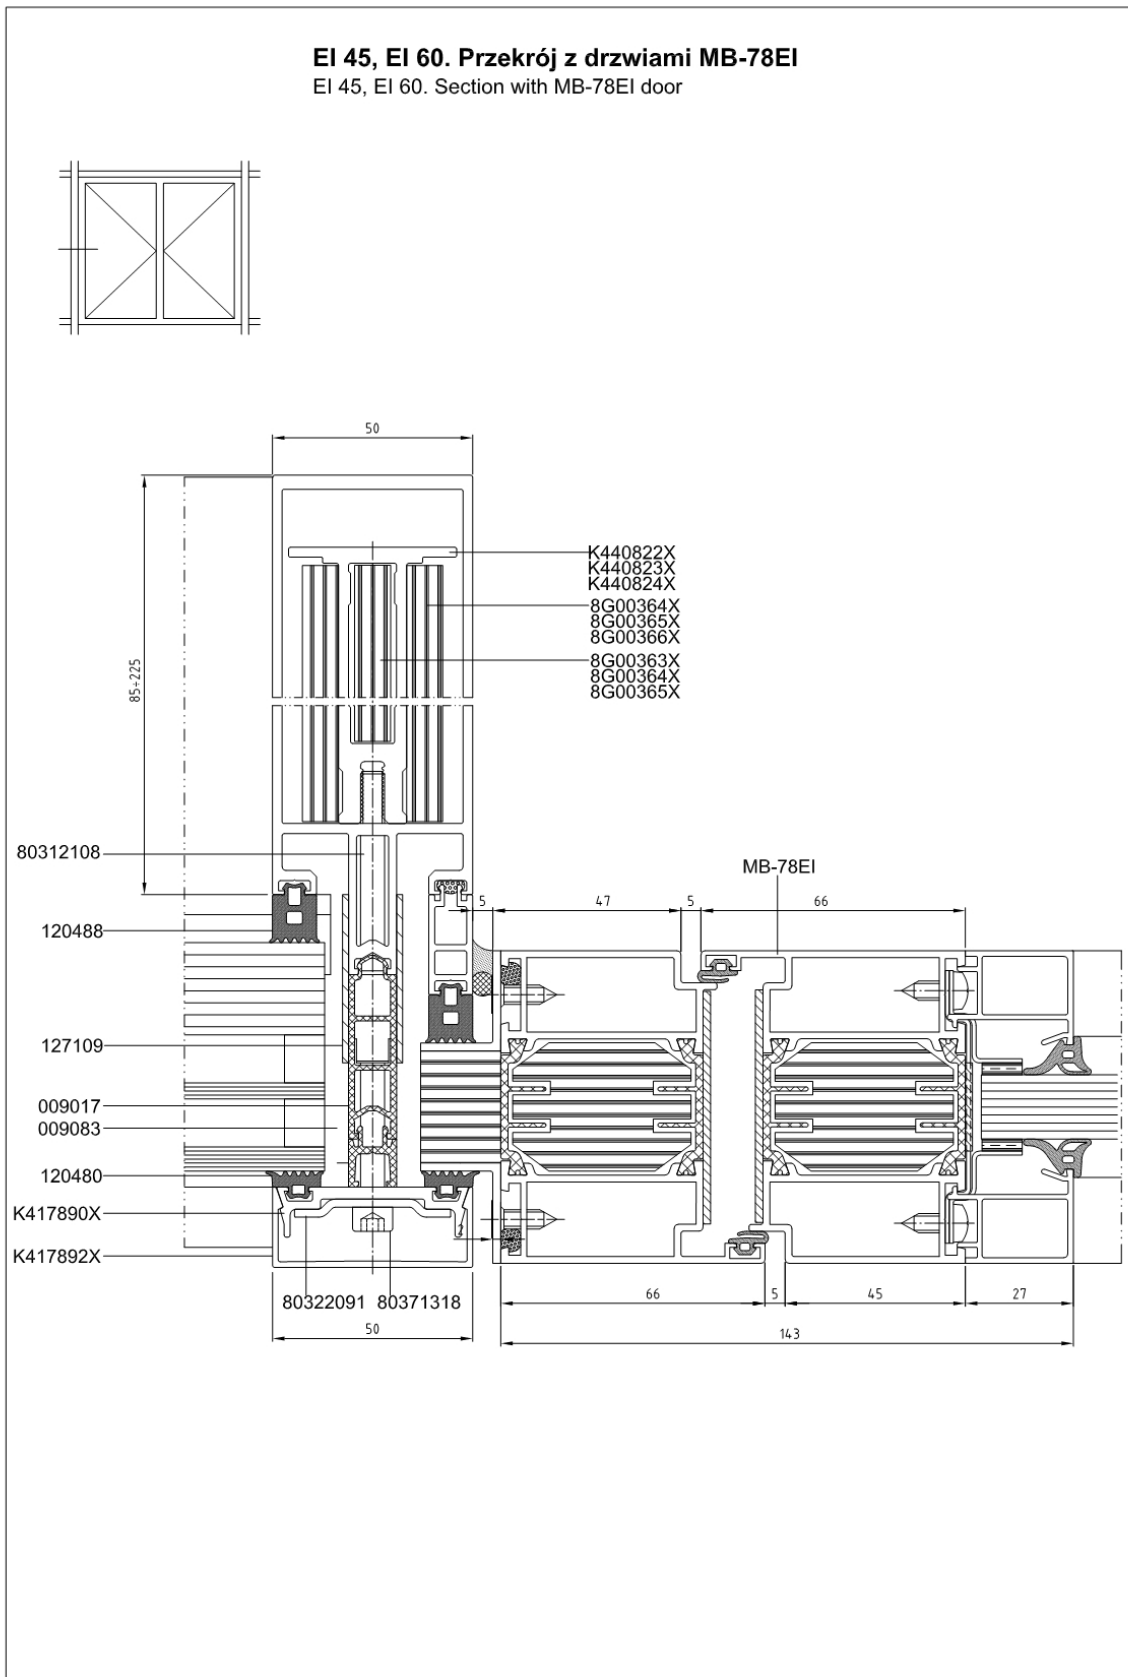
Installation scheme of the MB-78EI system door fixed in the MB-SR50N EI EI60 system wall (fixing details according to the MB-78EI door system classification –
